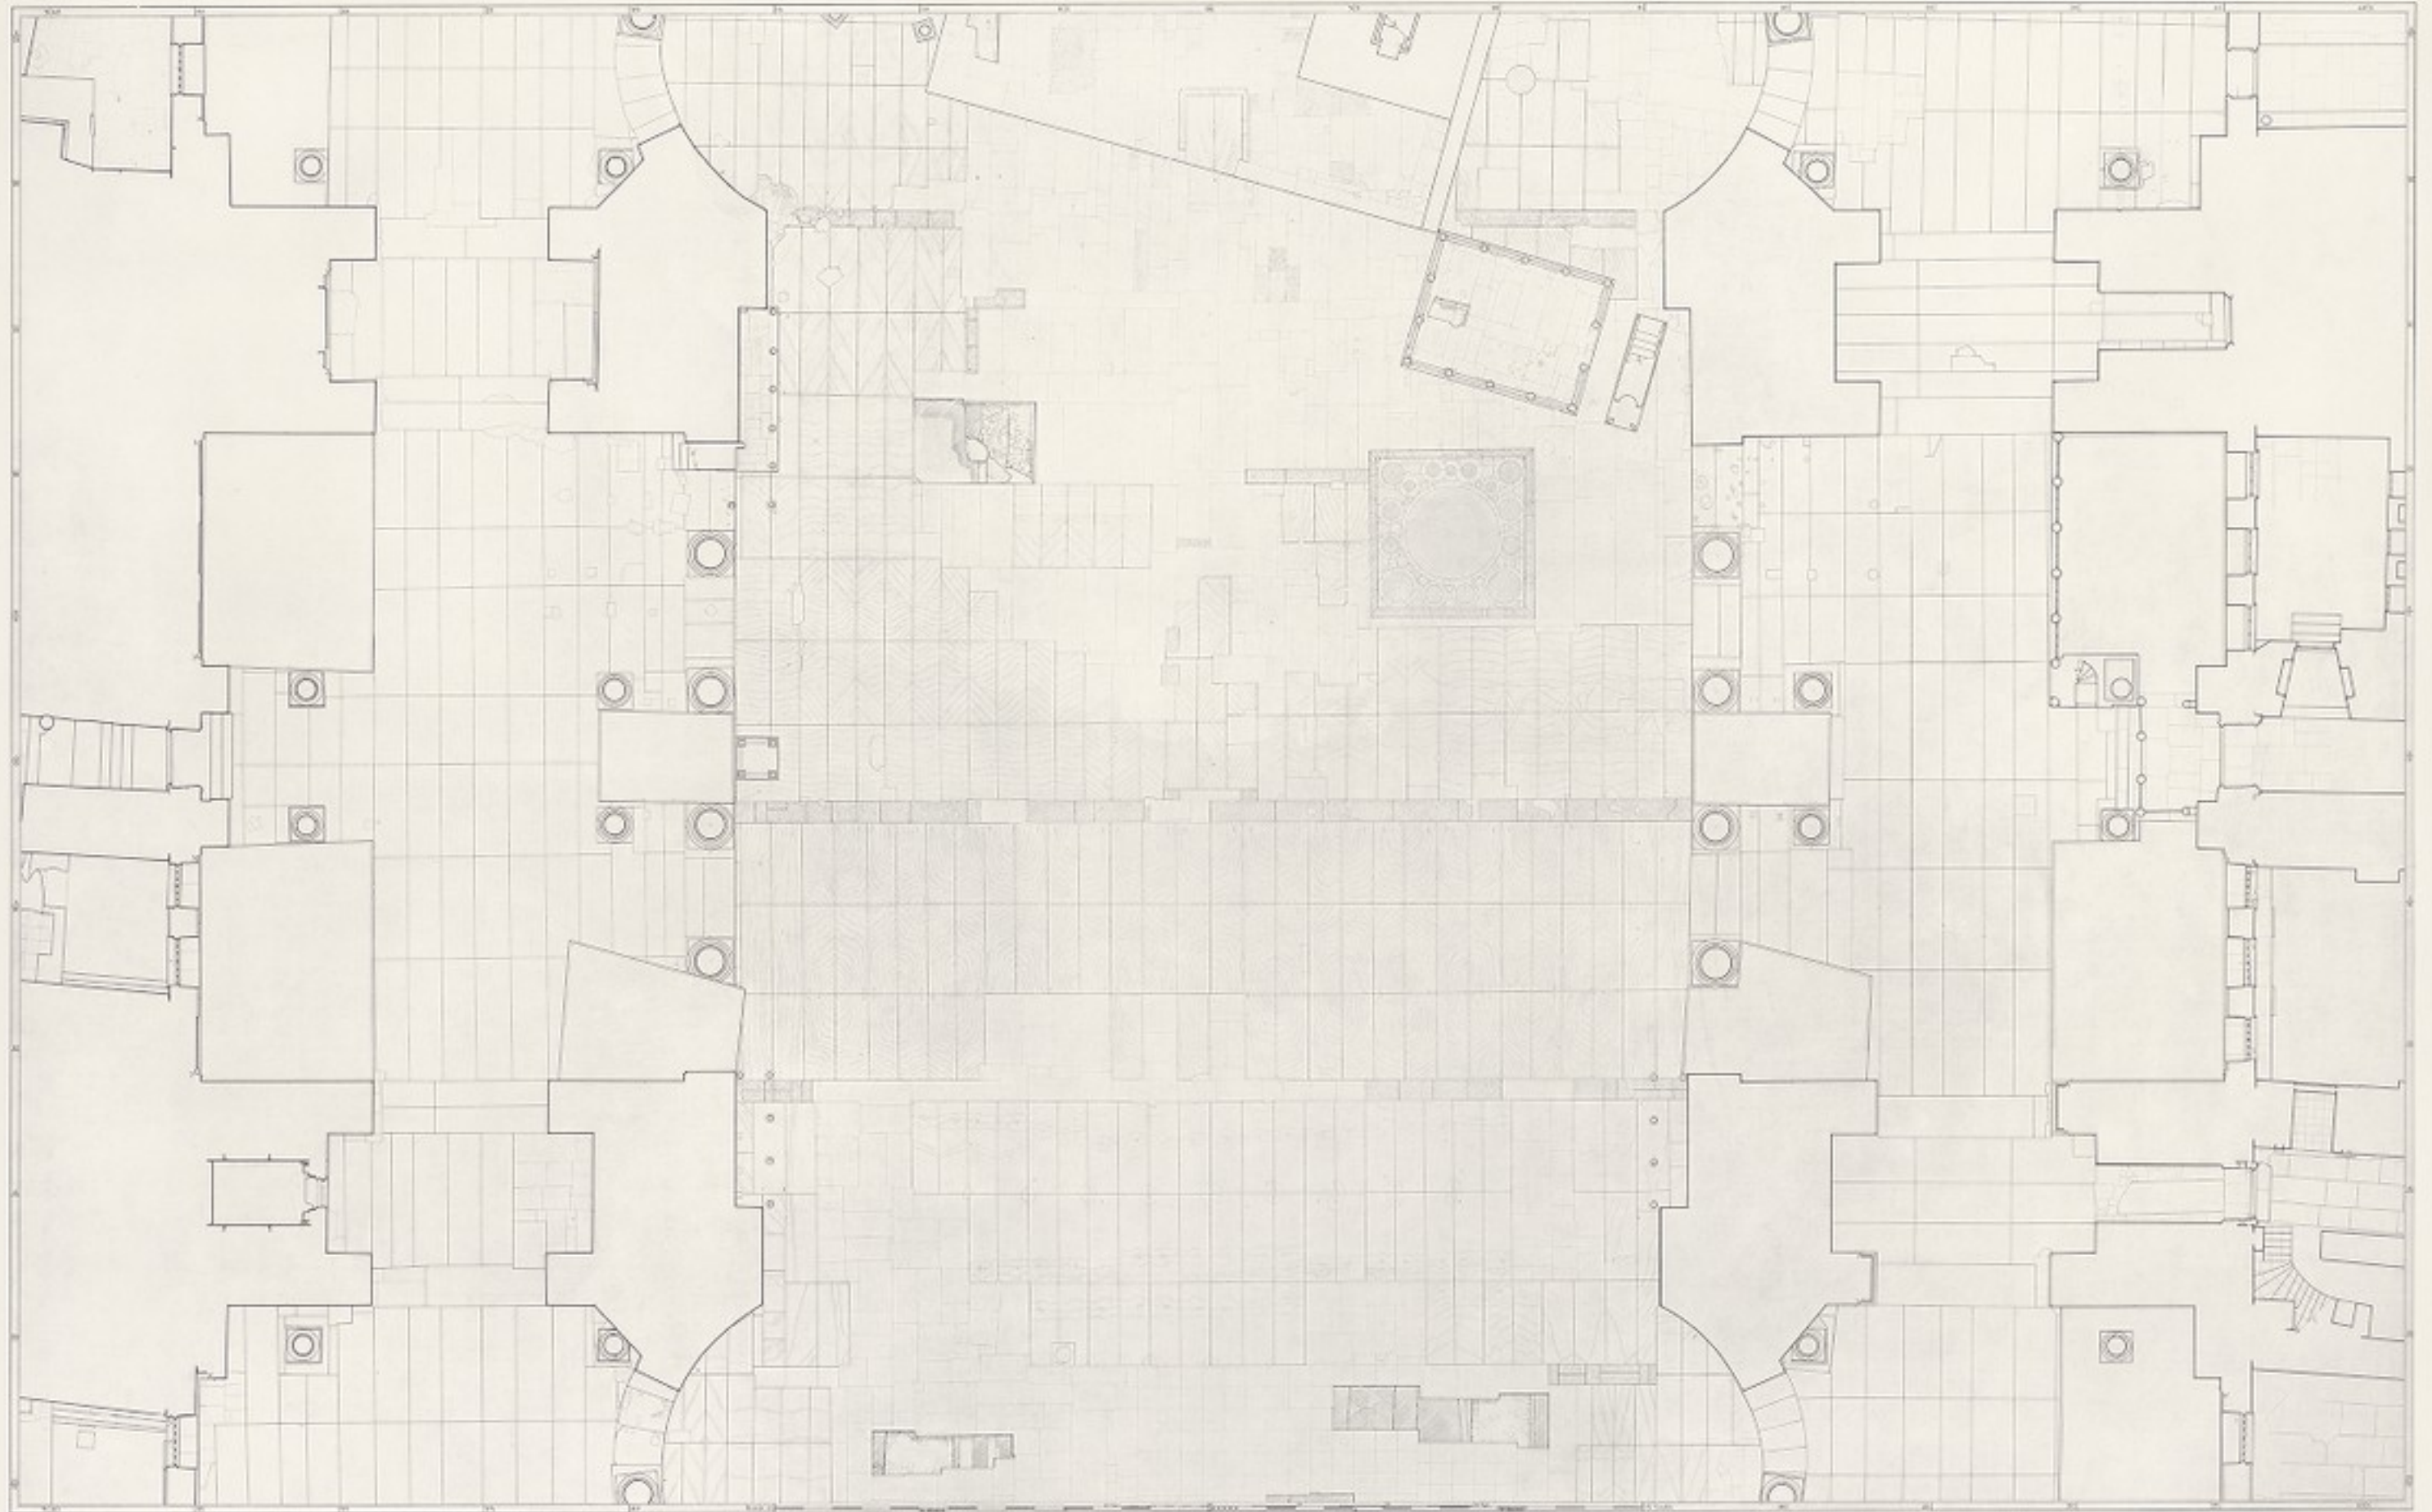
PLAN AT GROUND LEVEL, CENTRAL AREAS:
